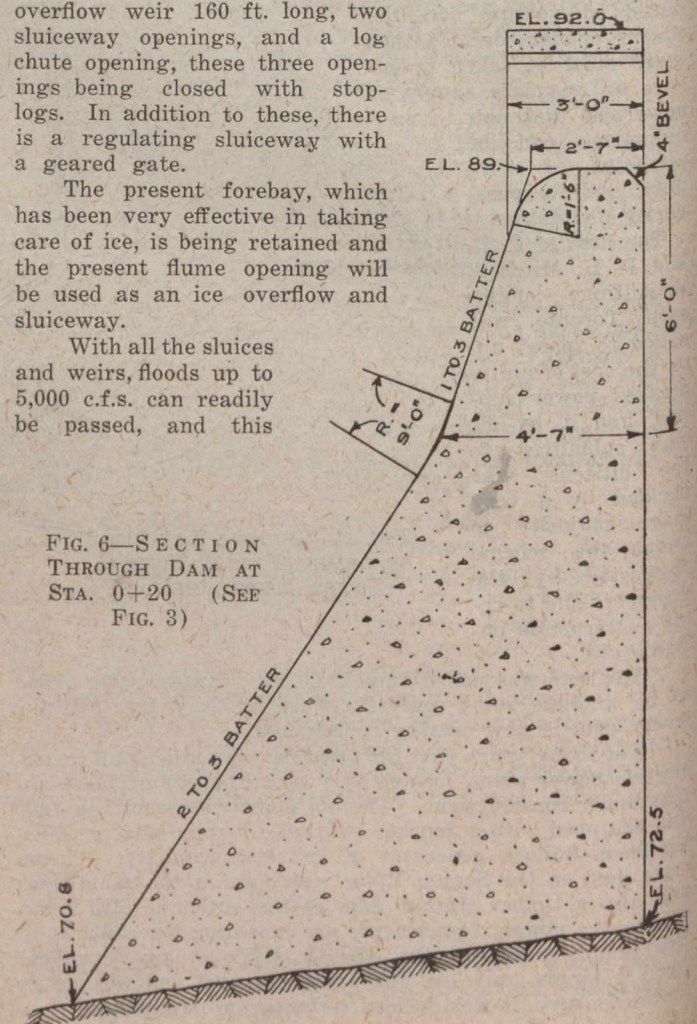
SECTION THROUGH DAM AT STA. 0+20 (SEE FIG. 3)
